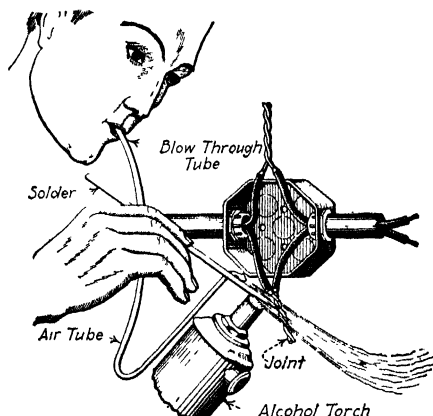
Soldering a joint with a small alcohol blow-torch.
